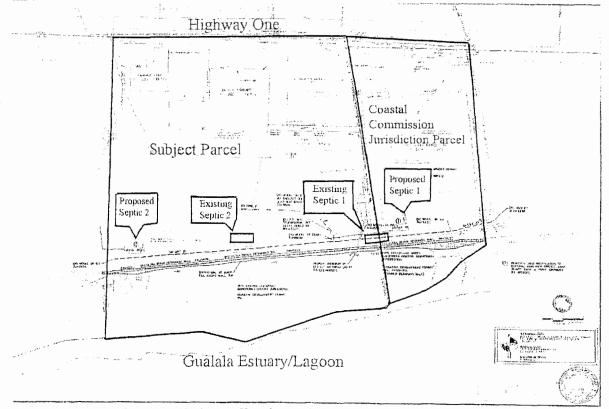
RAU site plan as modified by staff to show existing and proposed septic locations.
